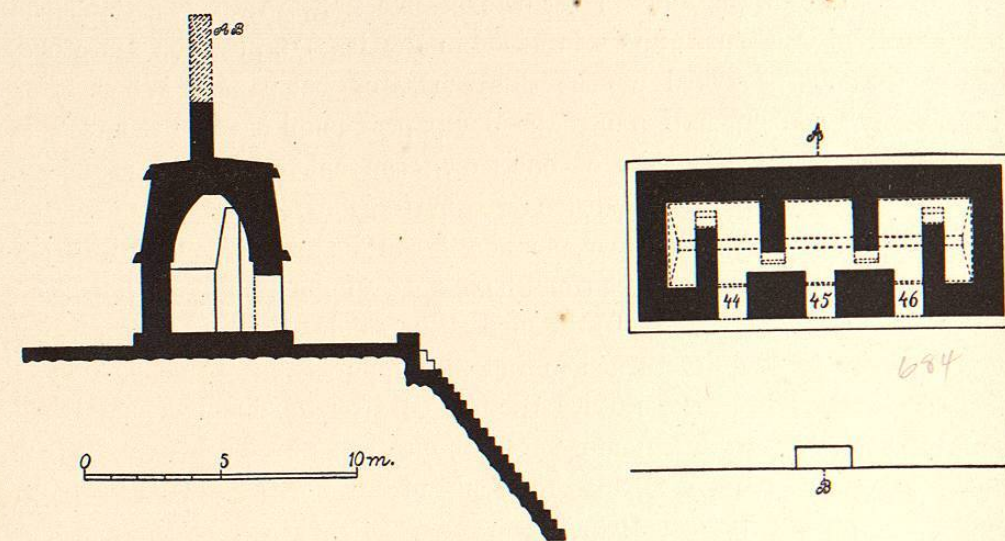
STRUCTURE 44: SECTION AND GROUND-PLAN (RESTORED).
